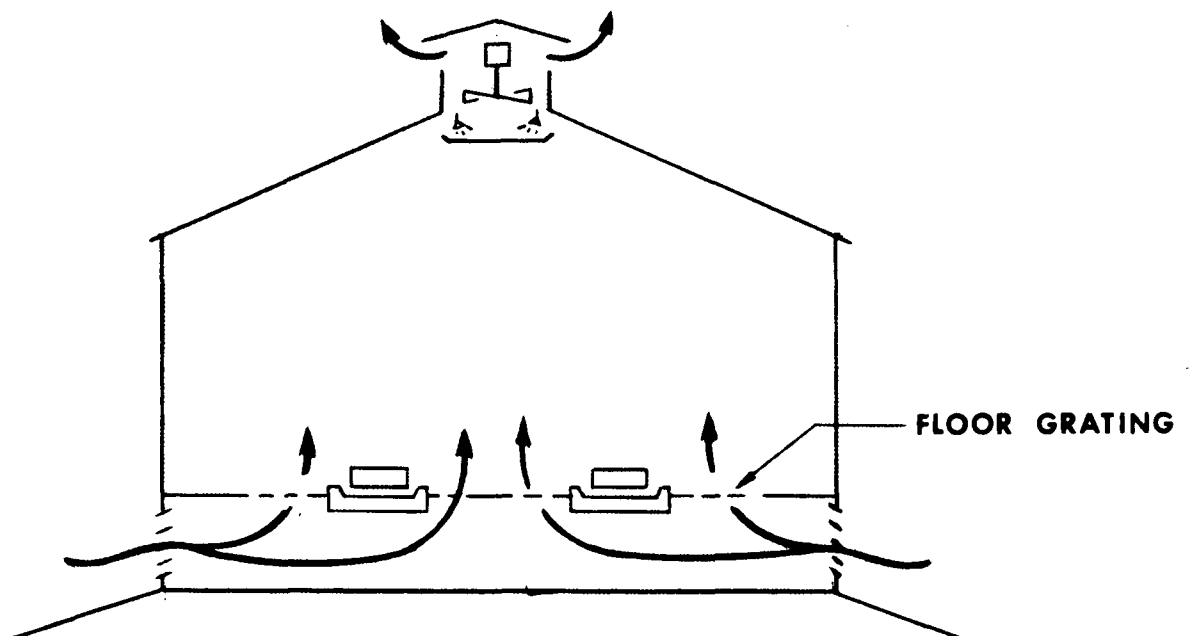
shows a building arrangement which helps to avoid this short circuiting of the collection system. Fresh air is drawn into the building below the working floor level and is allowed to pass up through gratings past the cells to the monitor collection system. Although sub-floor intakes may make the collection virtually 100 percent efficient, all roof monitor collection systems suffer the disadvantages that very large quantities of ventilation air must be handled, 30,000 to 60,000 cfm per cell.
